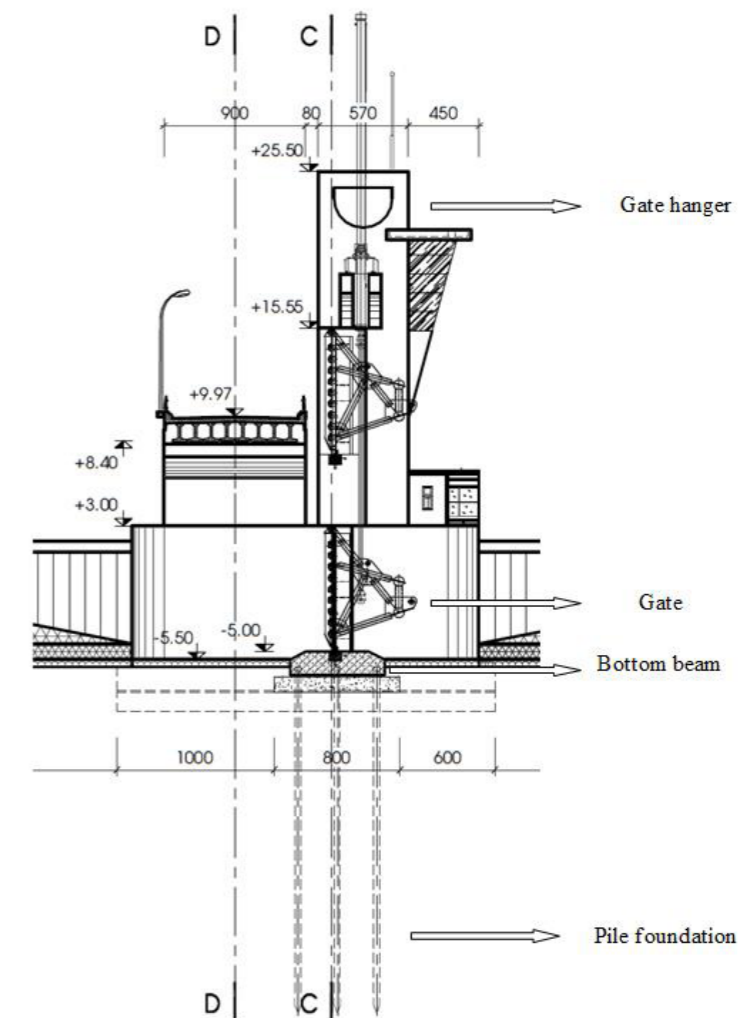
Longitudinal section of one pillar of Cai Be sluice gate
